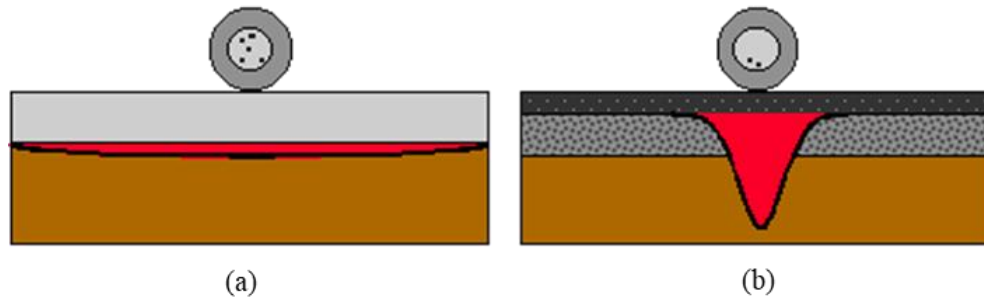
Load Distribution Mechanism in Rigid and Flexible Pavement, (a) Concrete (Rigid) Pavement, (b) Asphalt (Flexible) Pavement [33]
